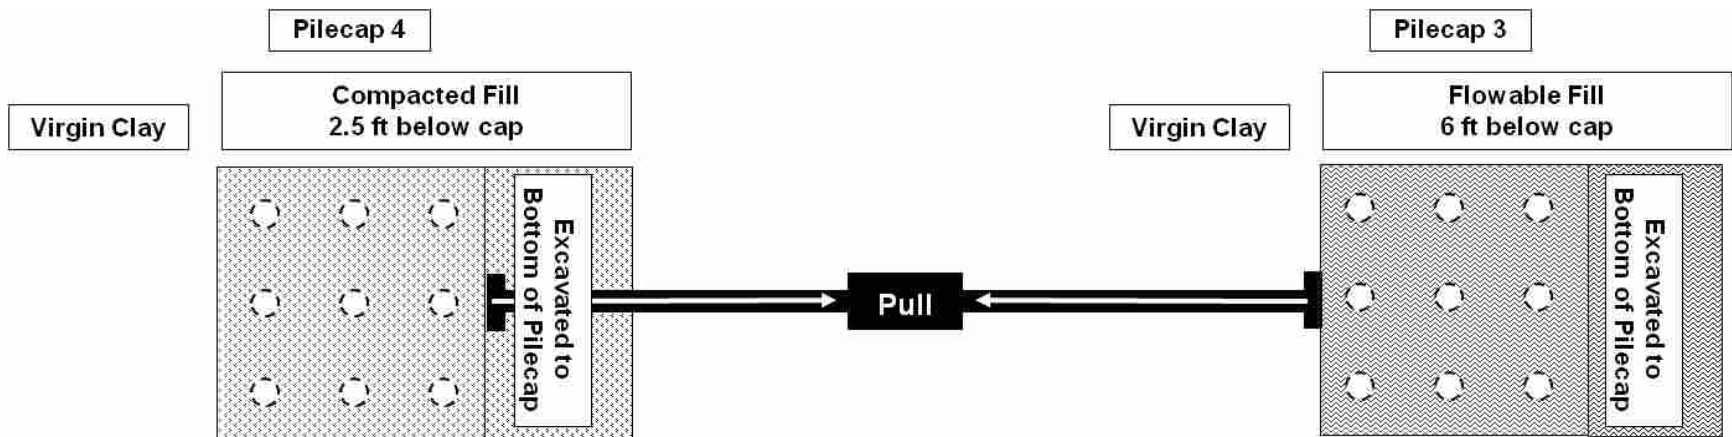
Schematic plan view of Test 3 (See Figure 5-4 for dimensions)
